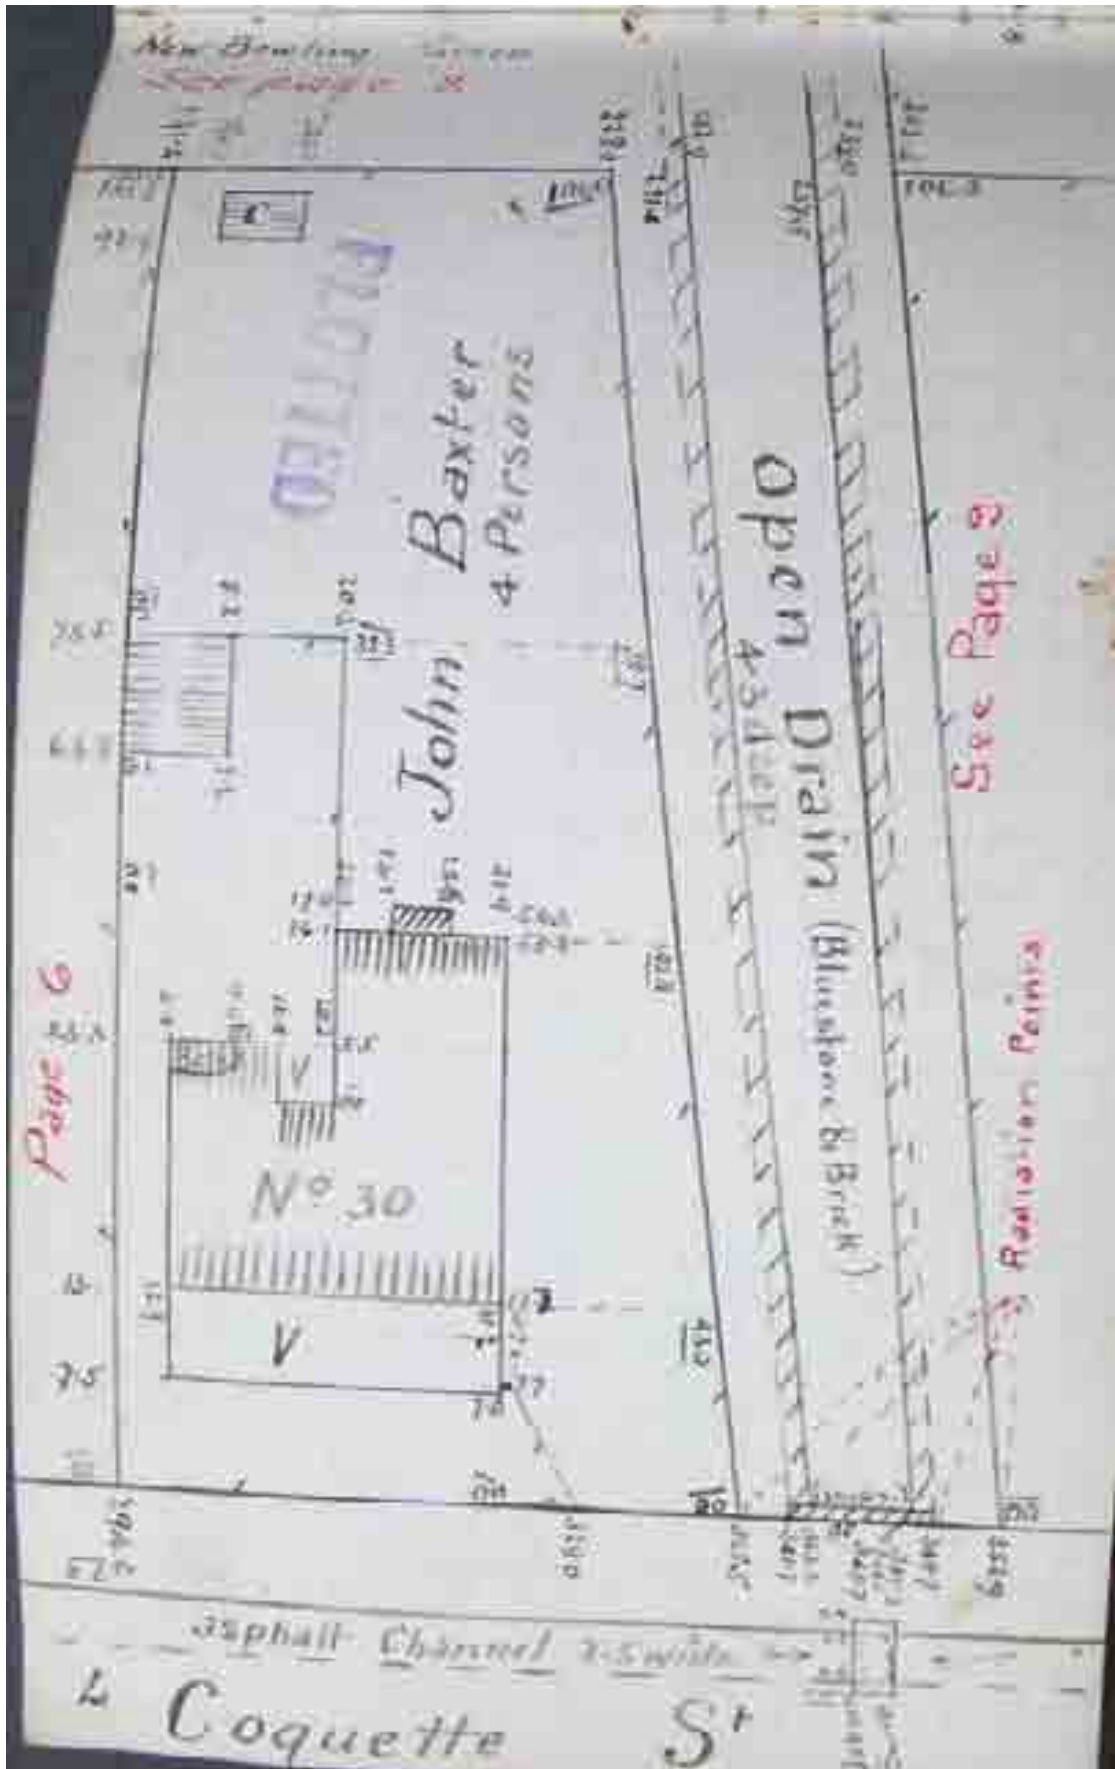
Sketch plan of the property at 30 Coquette Street, showing the adjacent “open drain” constructed of bluestone and brick, c.1913. Source: Geelong Waterworks & Sewerage Trust Fieldbook, no. 163, p.7, c.1913, Barwon Water collection.
